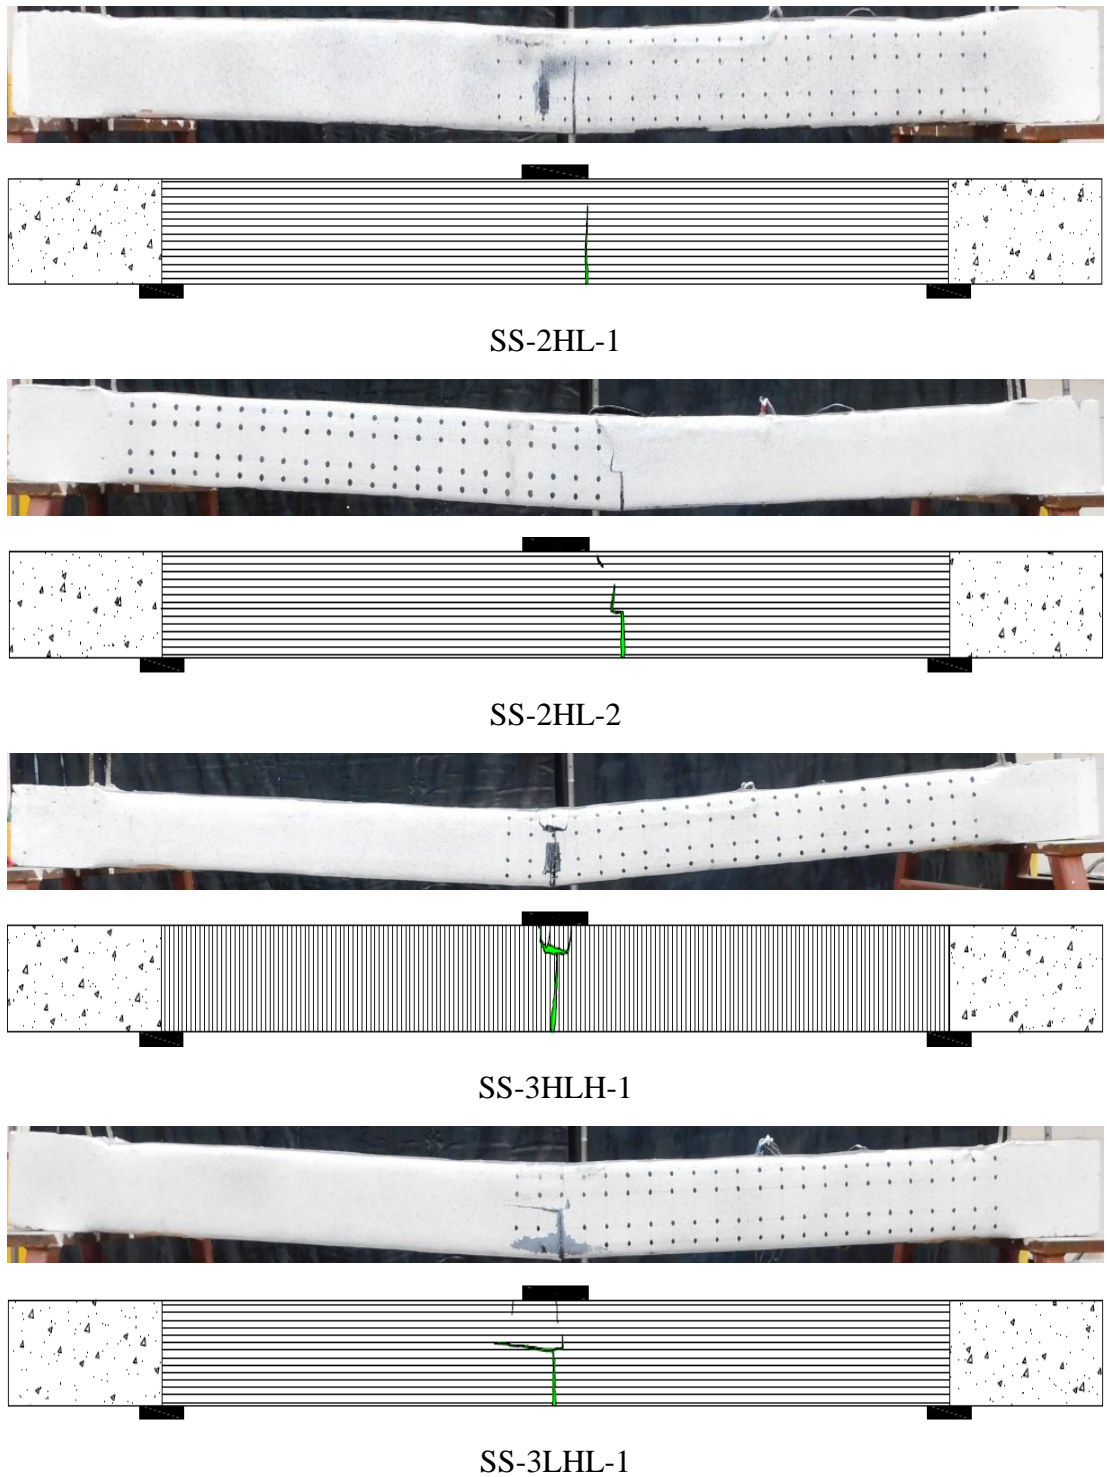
Failure mode and crack patterns for all columns at failure.
